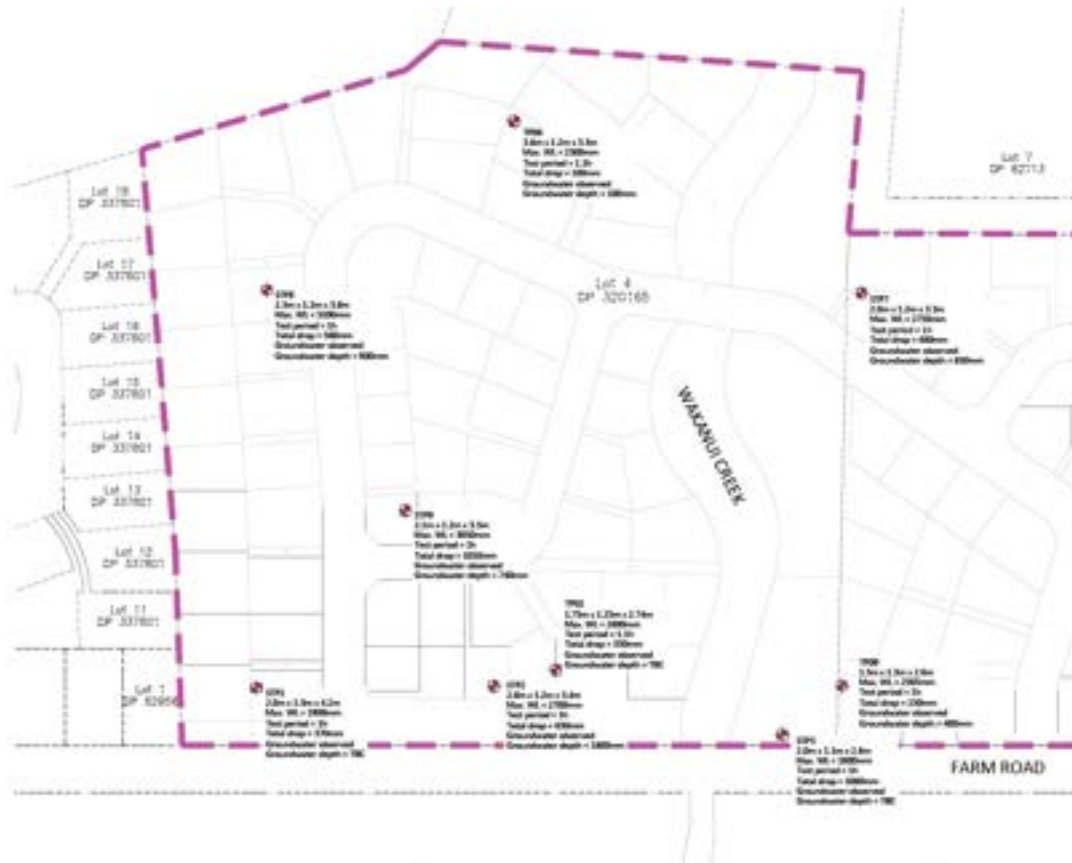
Infiltration Test Pit Location Plan (Western Part)
